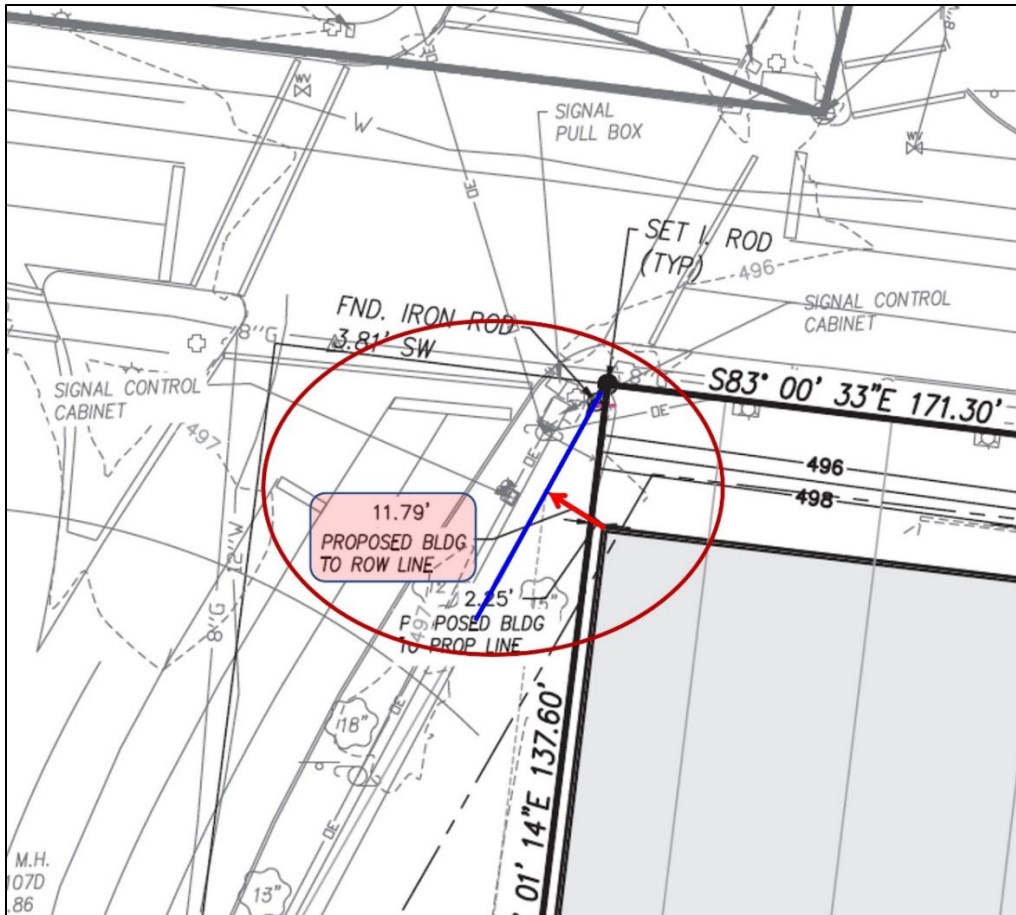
The northwest corner of the site where the setback is proposed to be reduced.
